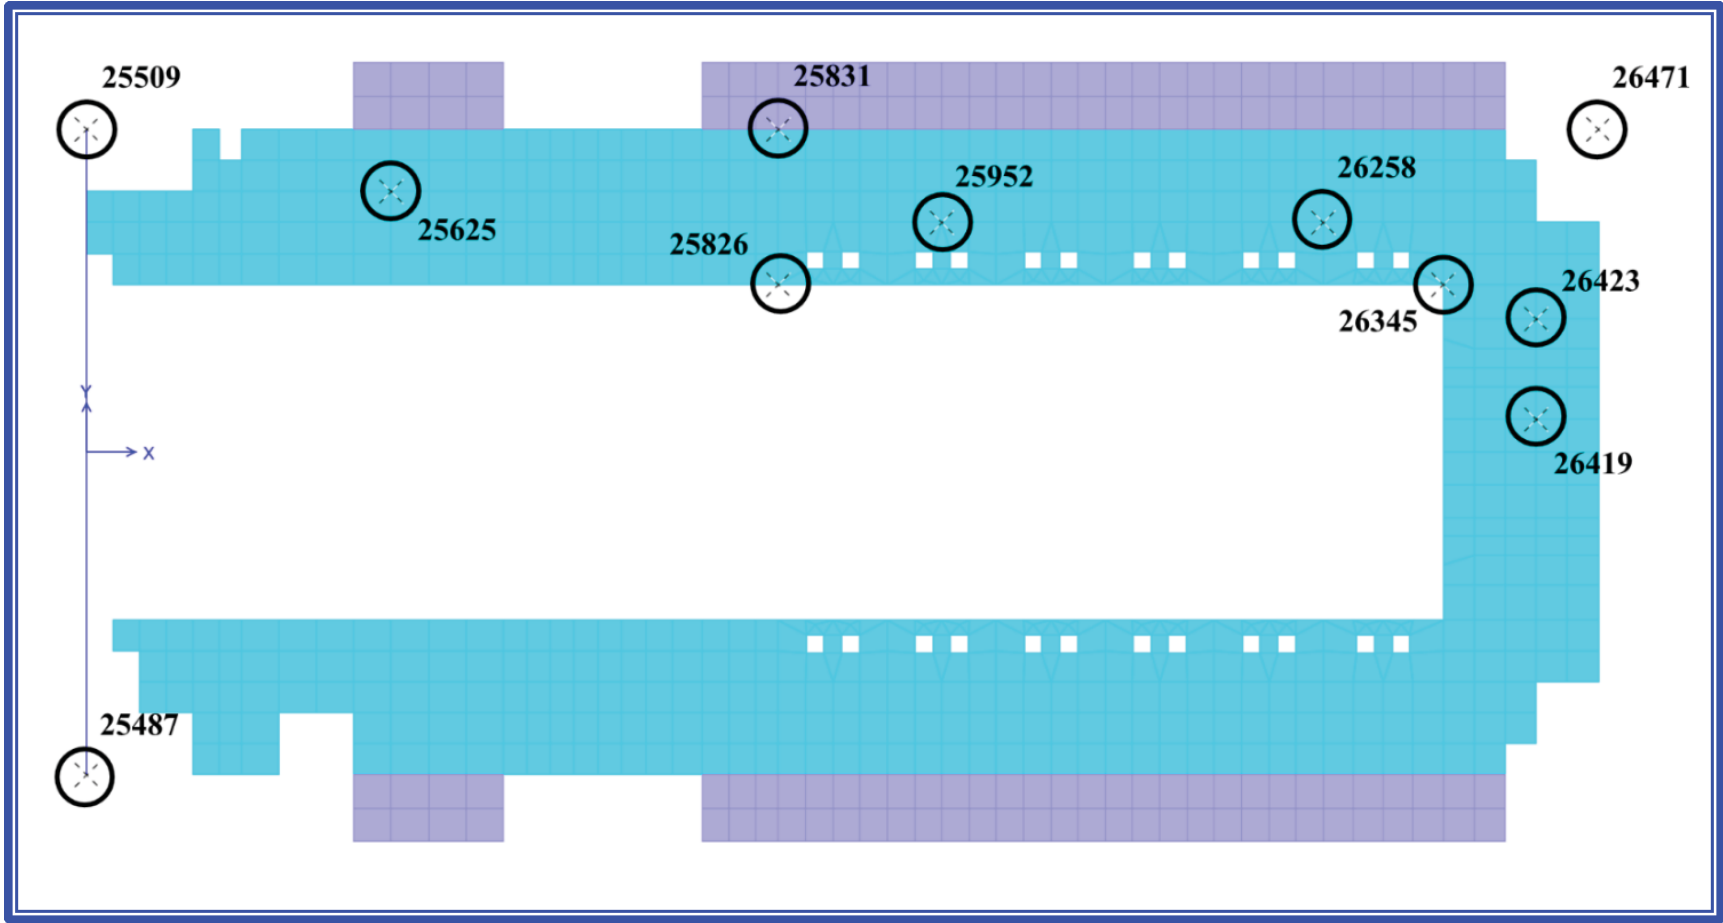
Roof ISRS Locations at TOC EL 181'-0"
